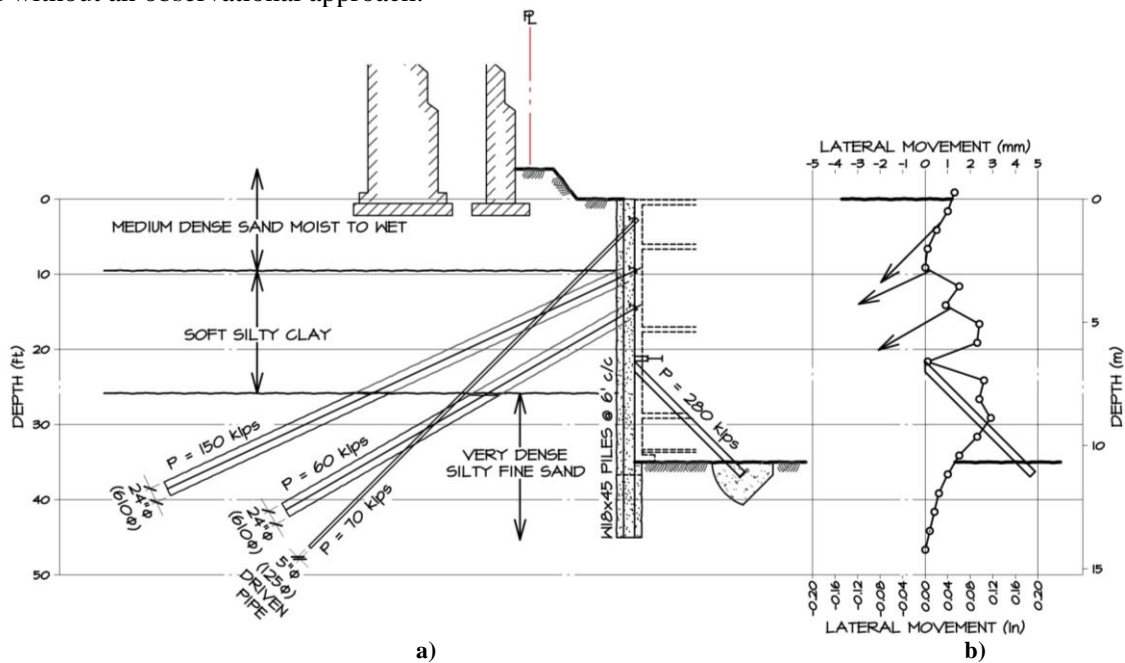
a) Shoring design cross section adjacent to St. Paul's Church showing the final bracing as installed and b) inclinometer plot of shoring performance
